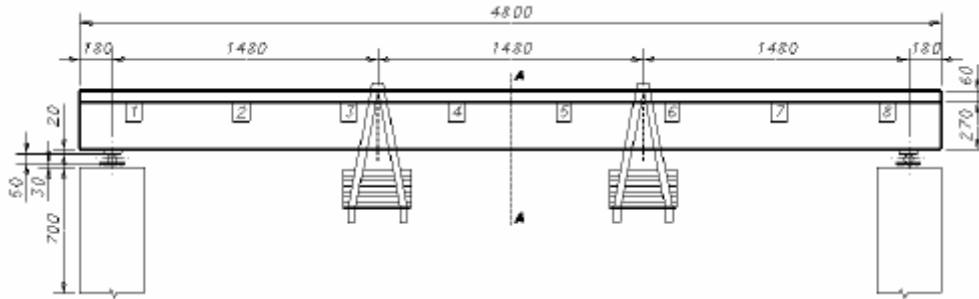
The elevation of beam specimen 1a with SP+N* type during long-term test. (Lukaszewska 2009)
